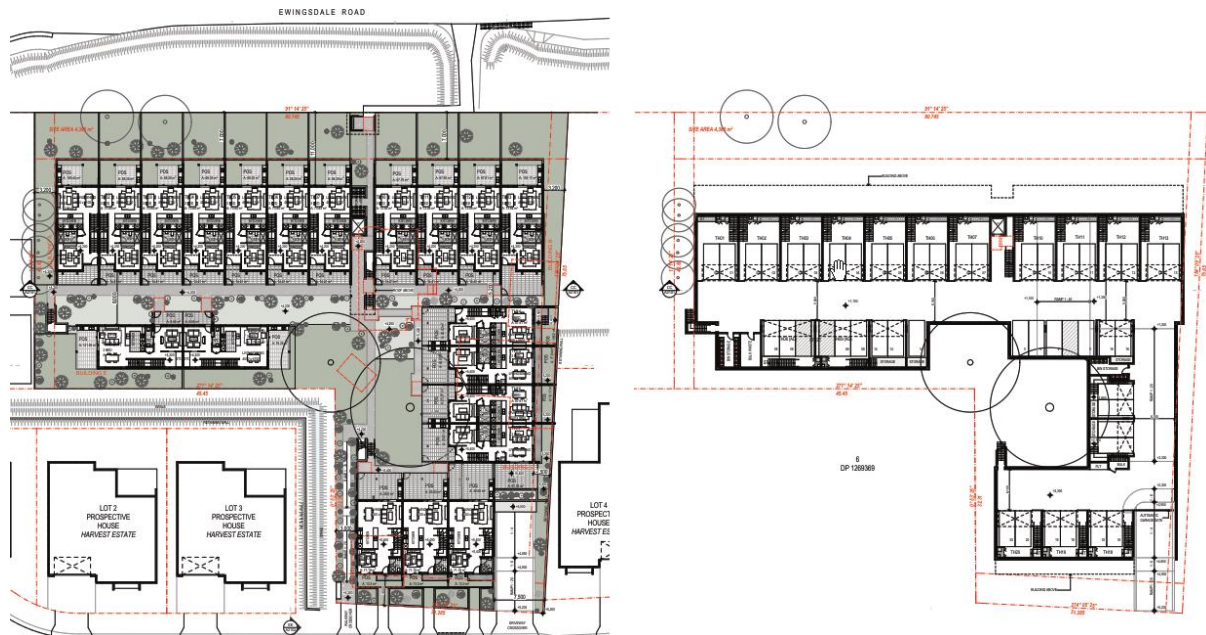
Proposed Development Site – Basement and Ground Floor (Source, MAI, 2023)
